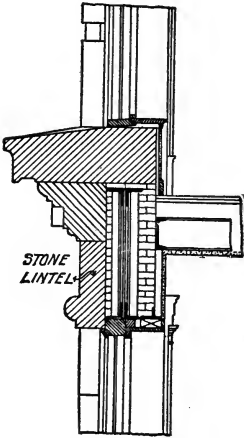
Spandrel Section, Fourth Floor. Gillender Building, New York.
